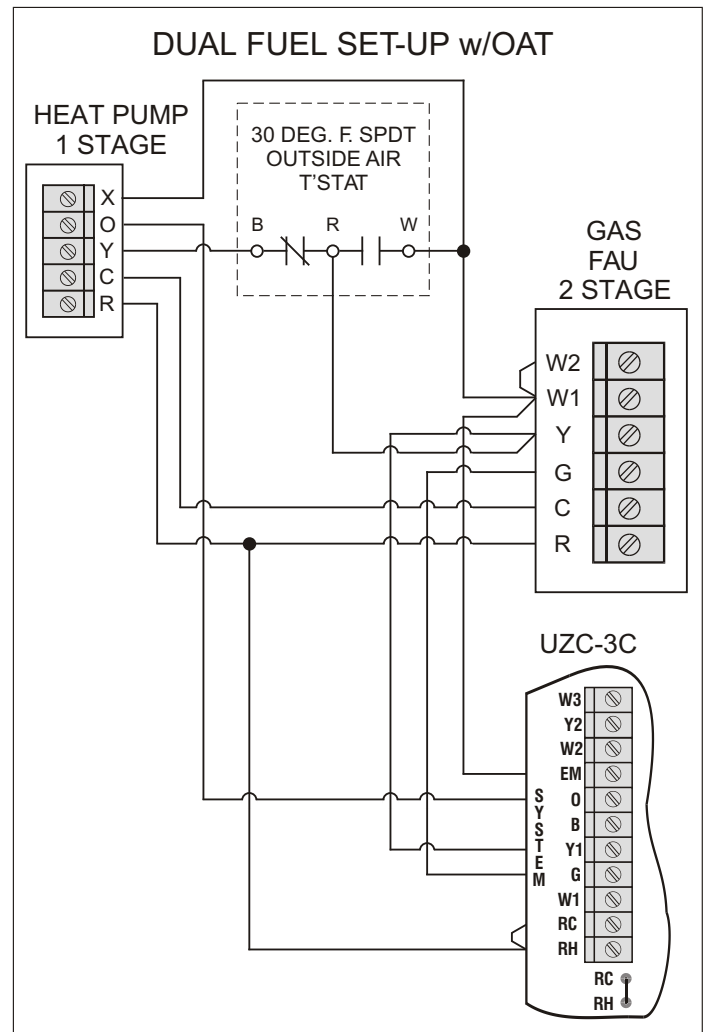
Dual Fuel Heat Pump w/Outside Air lock-out.
